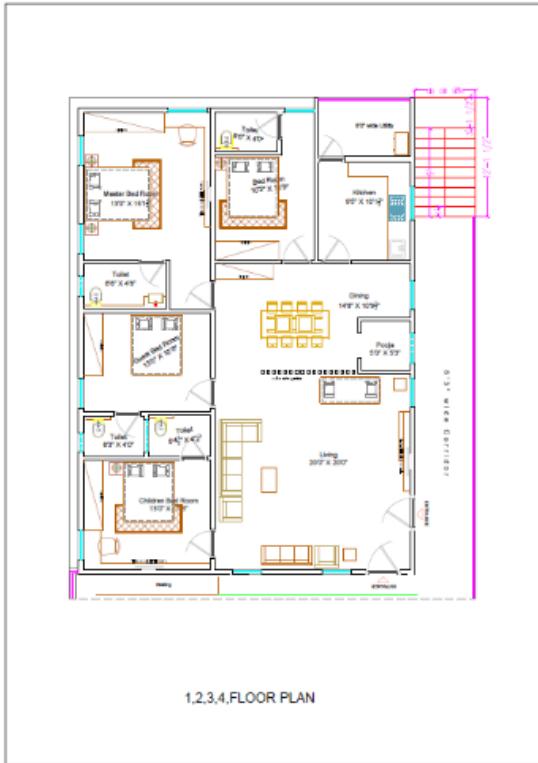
1,2,3,4 floor plans of G+4 Residential building
